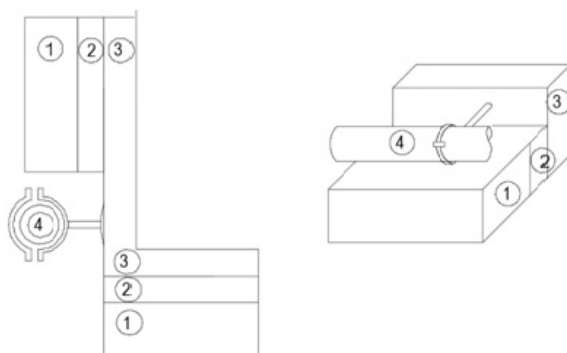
Facade gas pipeline model: 1 – Insulation material; 2 – Air gap; 3 – Exterior foundation wall of the building; 4 – Gas pipeline.
